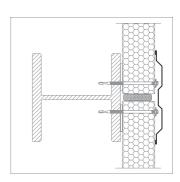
Ob-35.1 flashing "Panel joint masking strip with valley"
